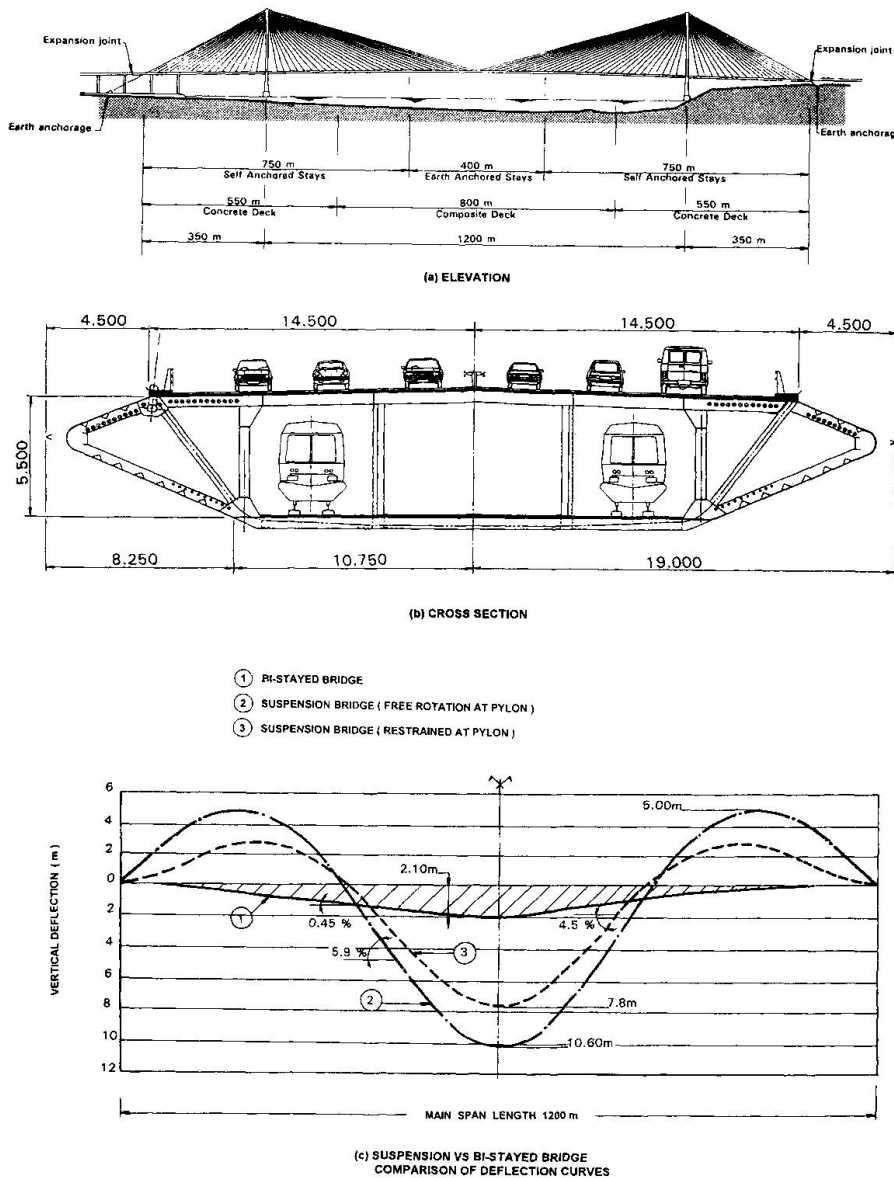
Example of 1,200 m. Bi-stayed Bridge
